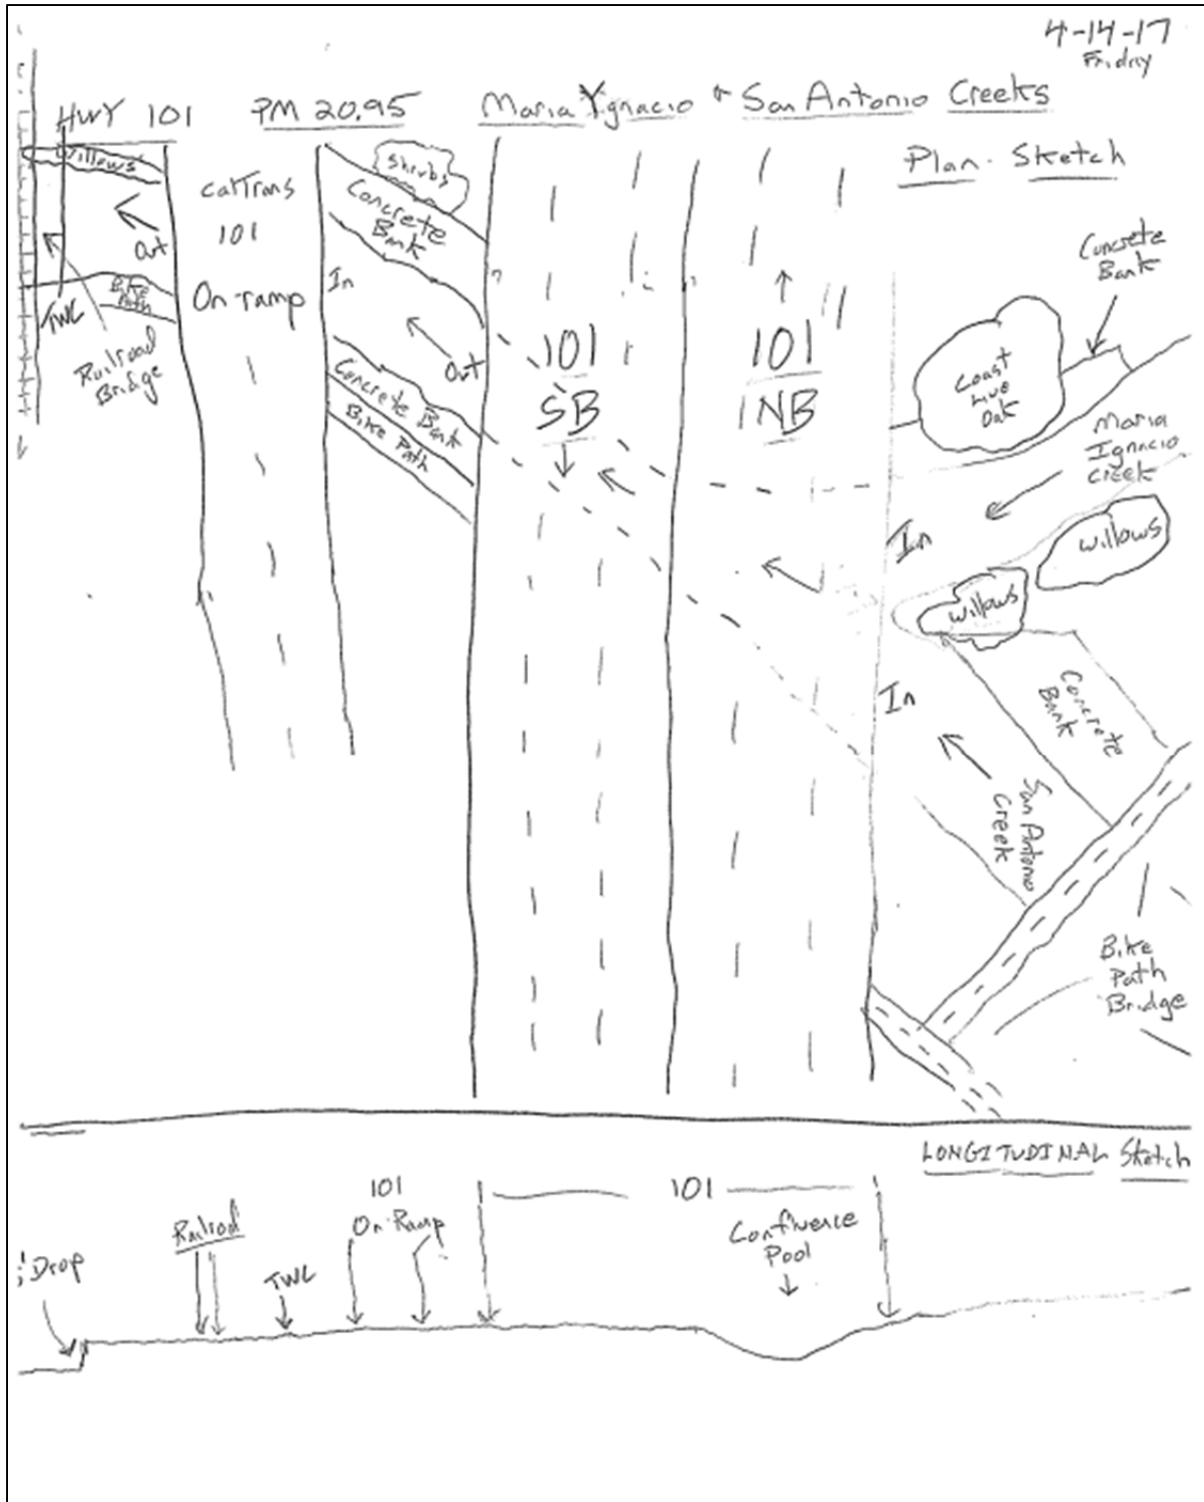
Site sketch for Santa Barbara County, Route 101, PM 20.95.
